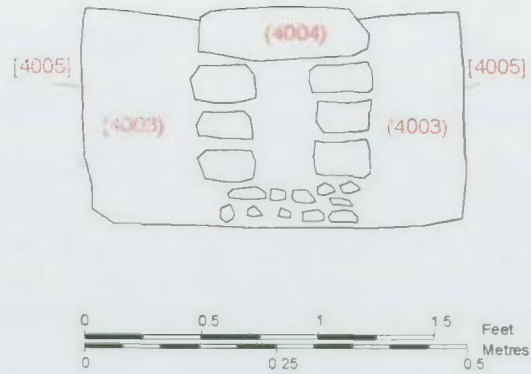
Section through culvert [4004], Trench 4. (Scale 1:10).
